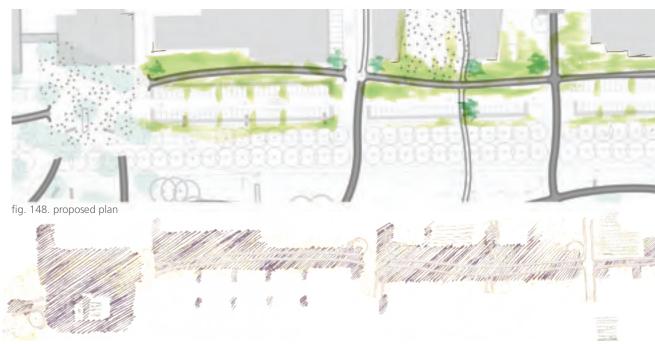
future rhythm of space (adding path and trees and piercing through the parking lot)
